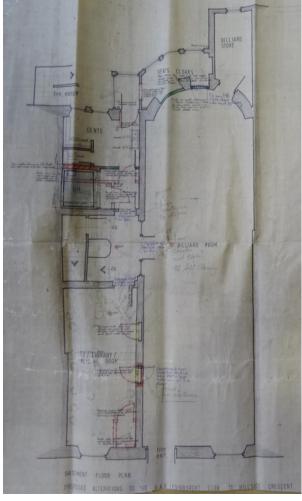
Lower ground floor plan, 1920. CEC Plan store
